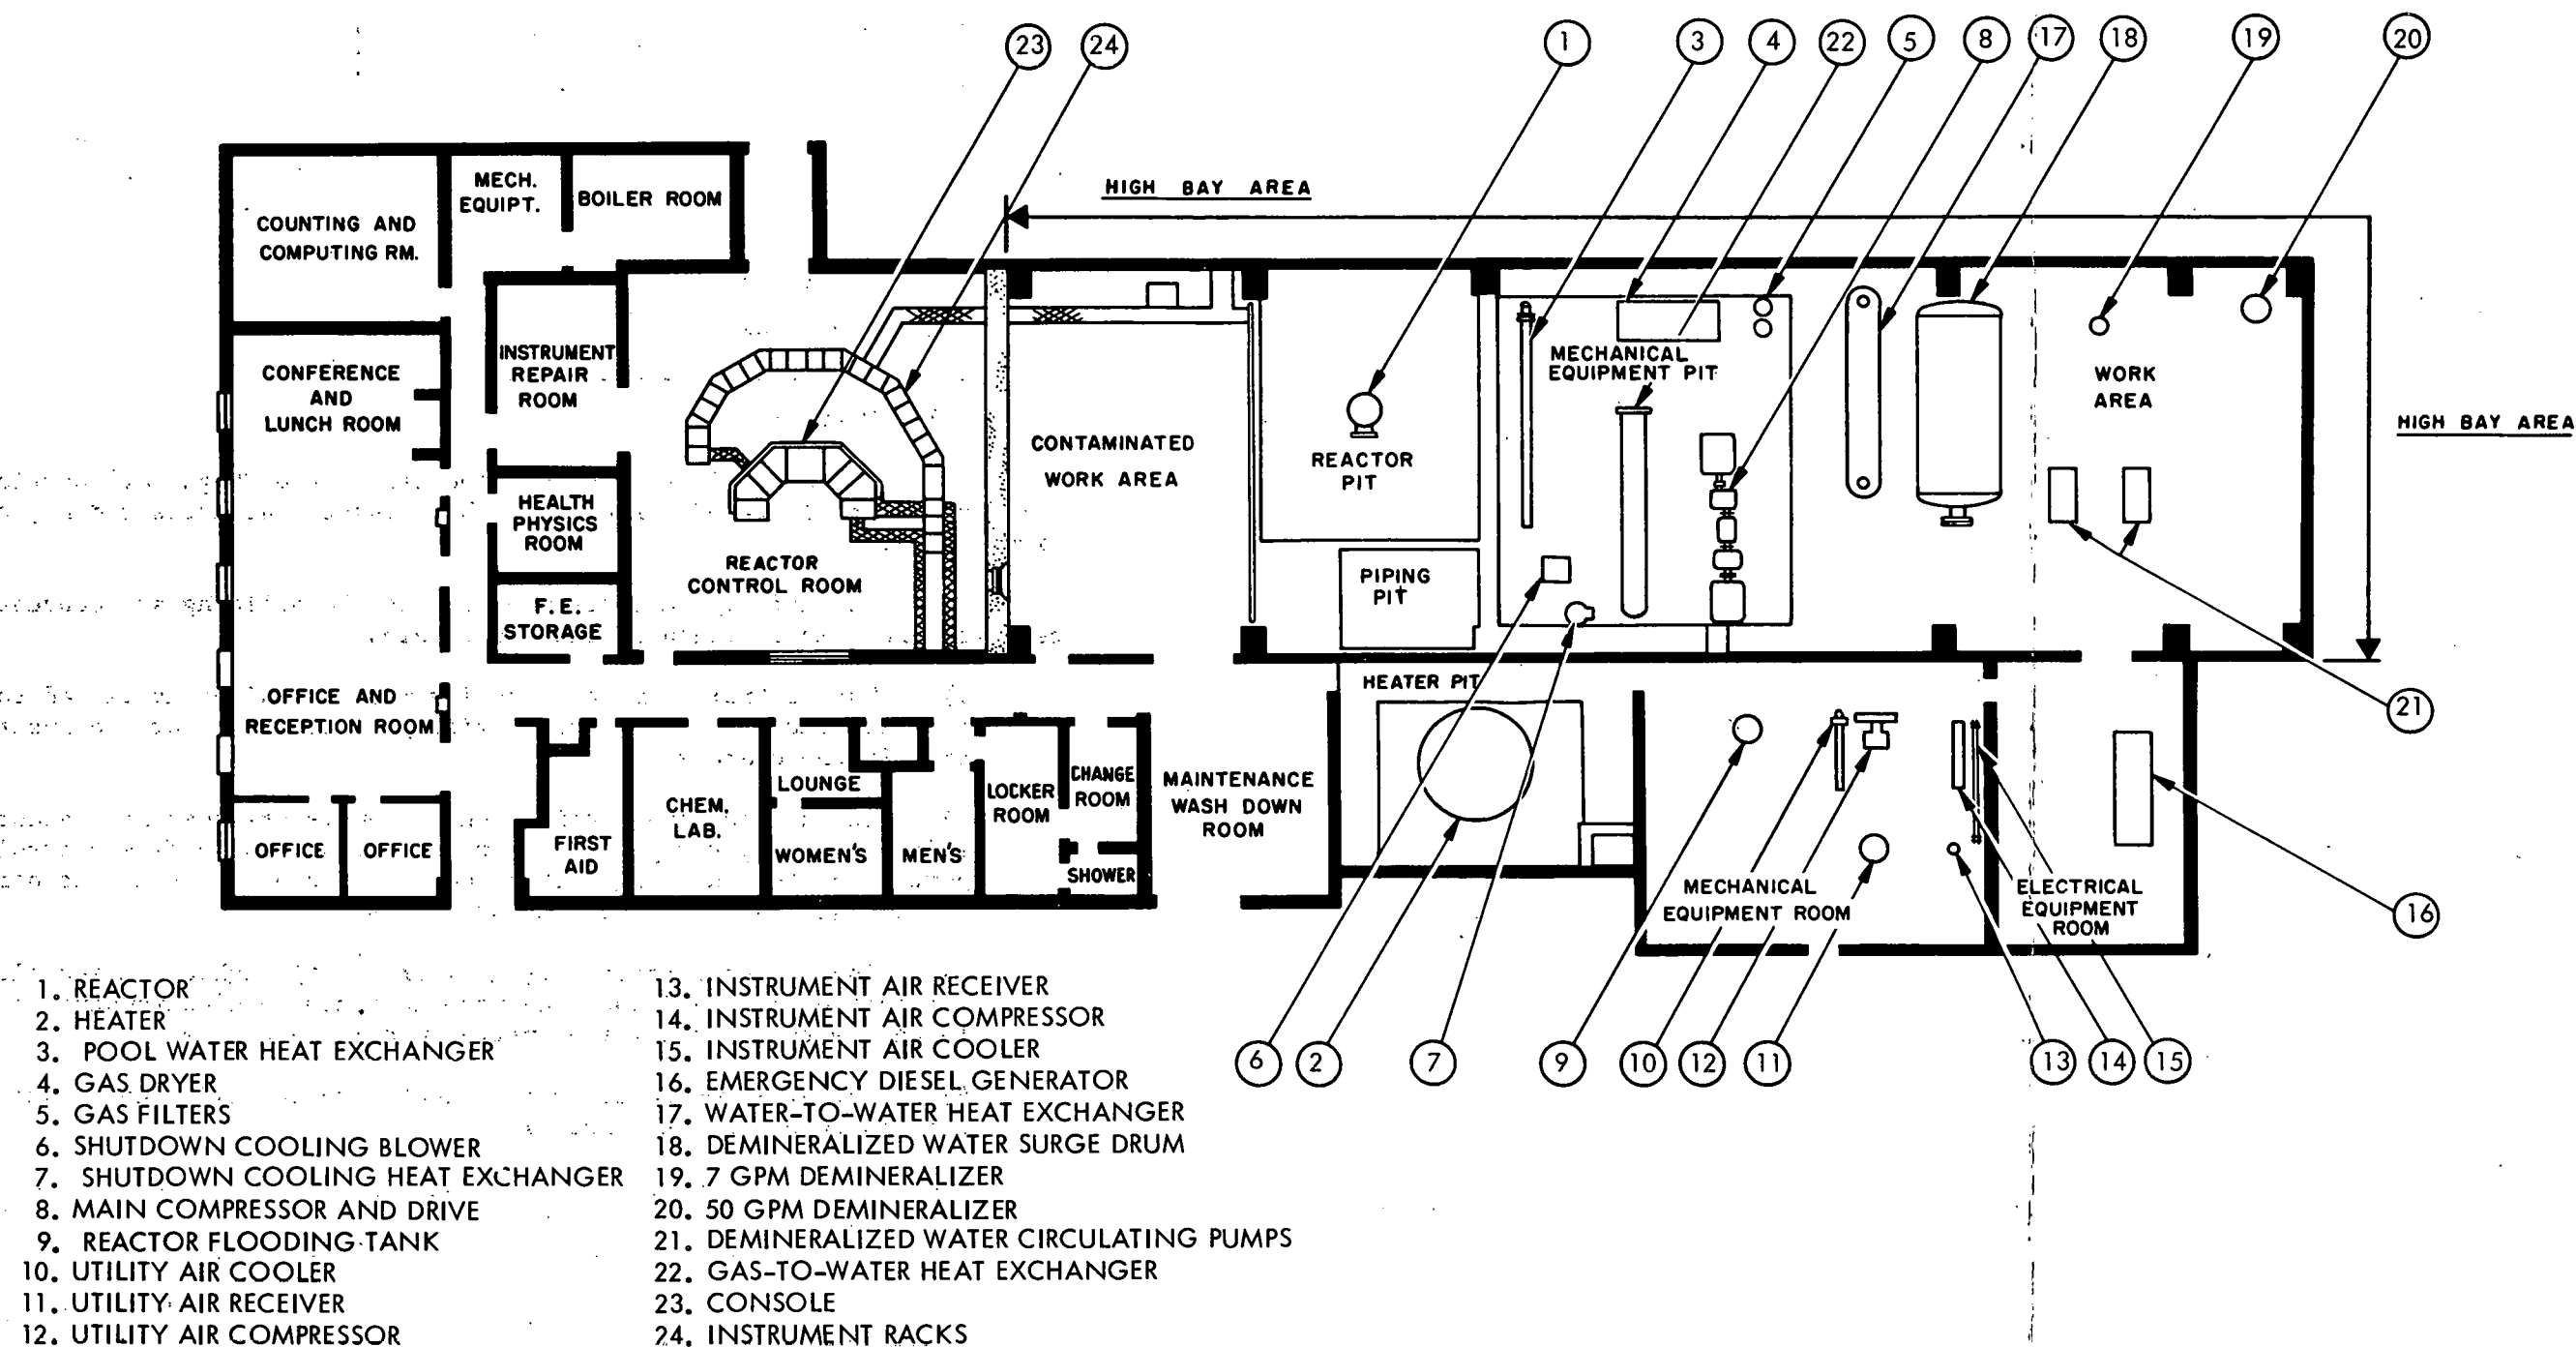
GCRE CONTROL AND TEST BUILDING FLOOR PLAN
